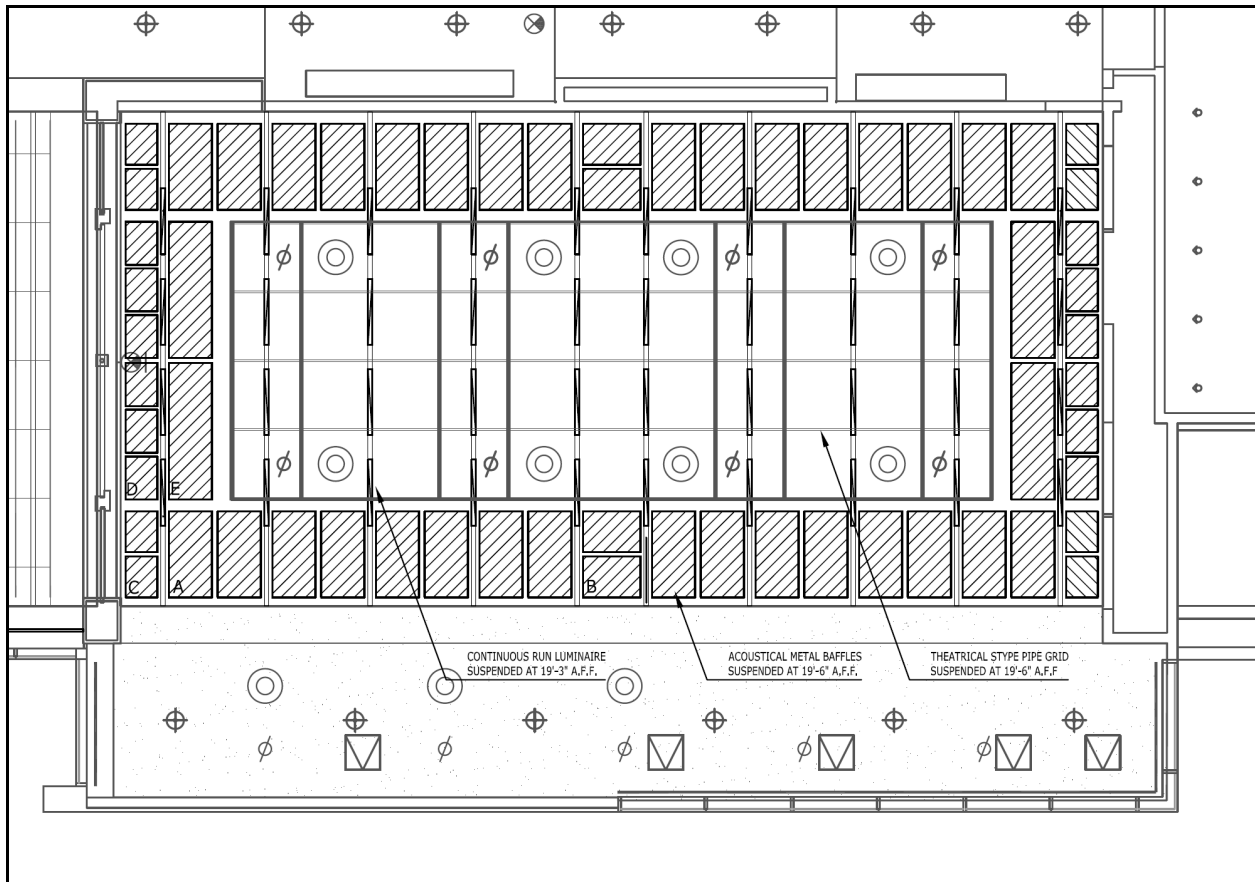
| Multi Purpose Room Reflected Ceiling Plan – Existing Design (Not To Scale)
